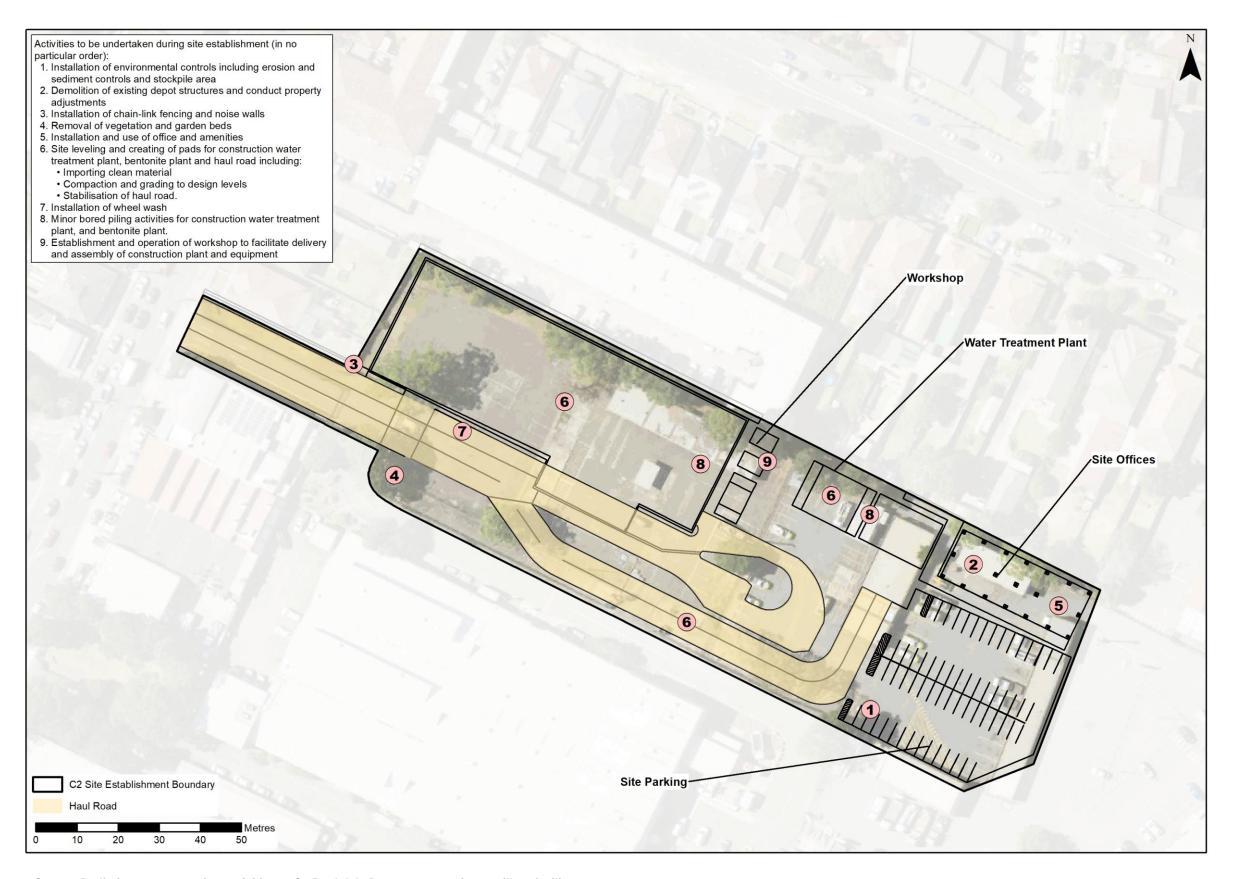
Stage 1 Preliminary construction activities at C2 Rockdale Depot construction ancillary facility
